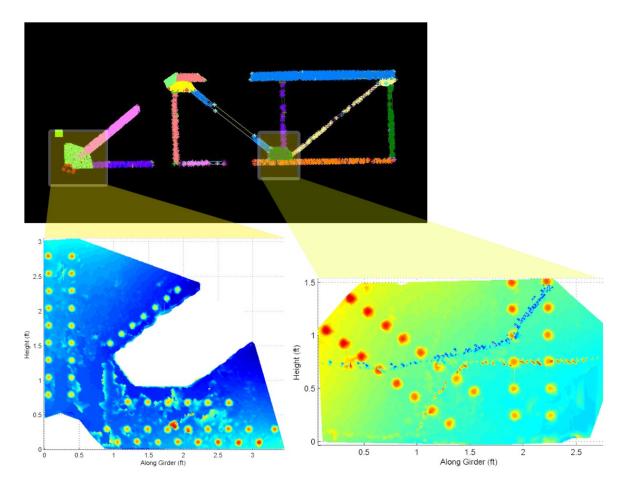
Measurements of Goose Creek Truss Bridge.
